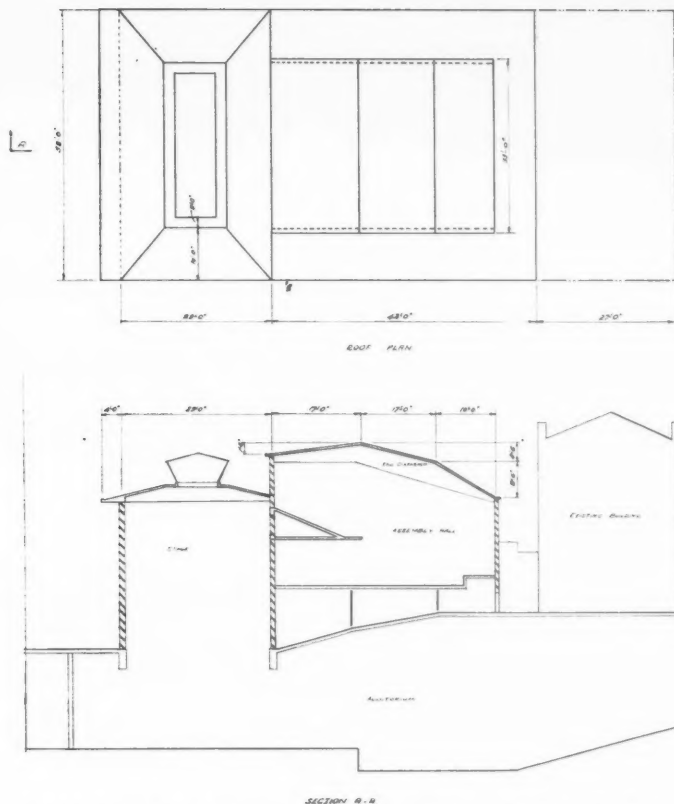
Roof plan and section of theatre for the R.A.D.A. Alister MacDonald [F]
